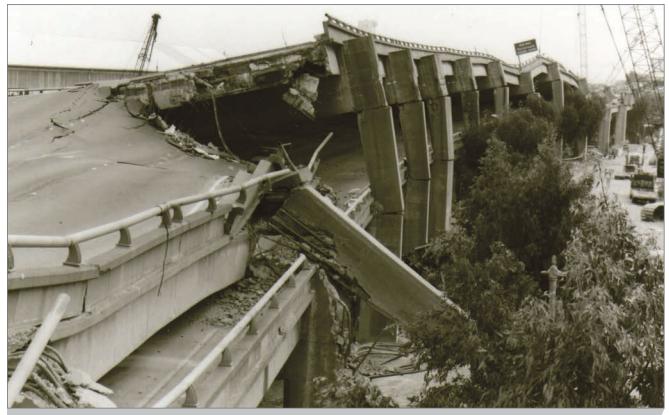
Collapsed Section of the Cypress Street Viaduct
